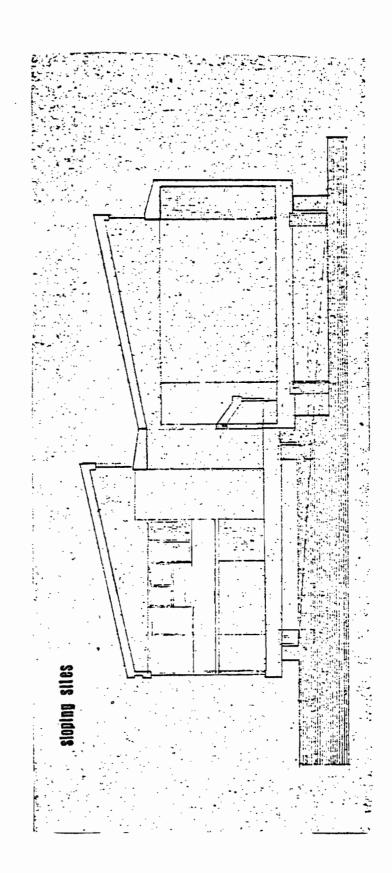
UNIT DESIGN: SITE PLANNING AS A DETERMINANT
